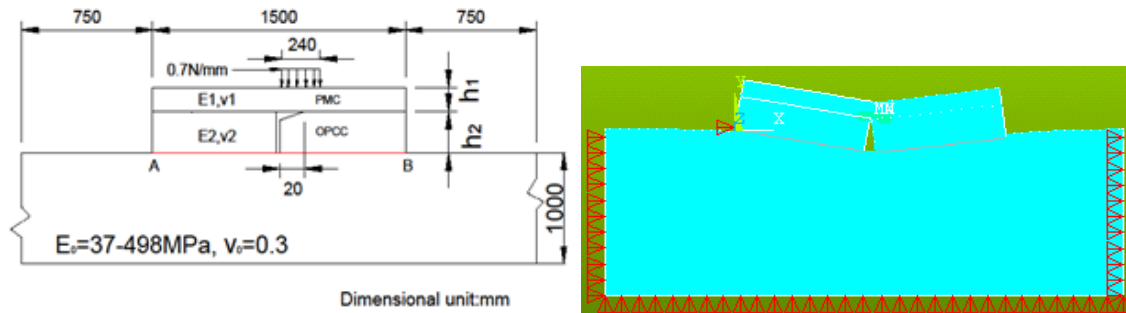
The model of Figure 9-3(c) with a 20mm-length interfacial crack subjected to standard vehicular wheel load (the wheel load acting on the right side of the existing crack in old OPCC pavement)
